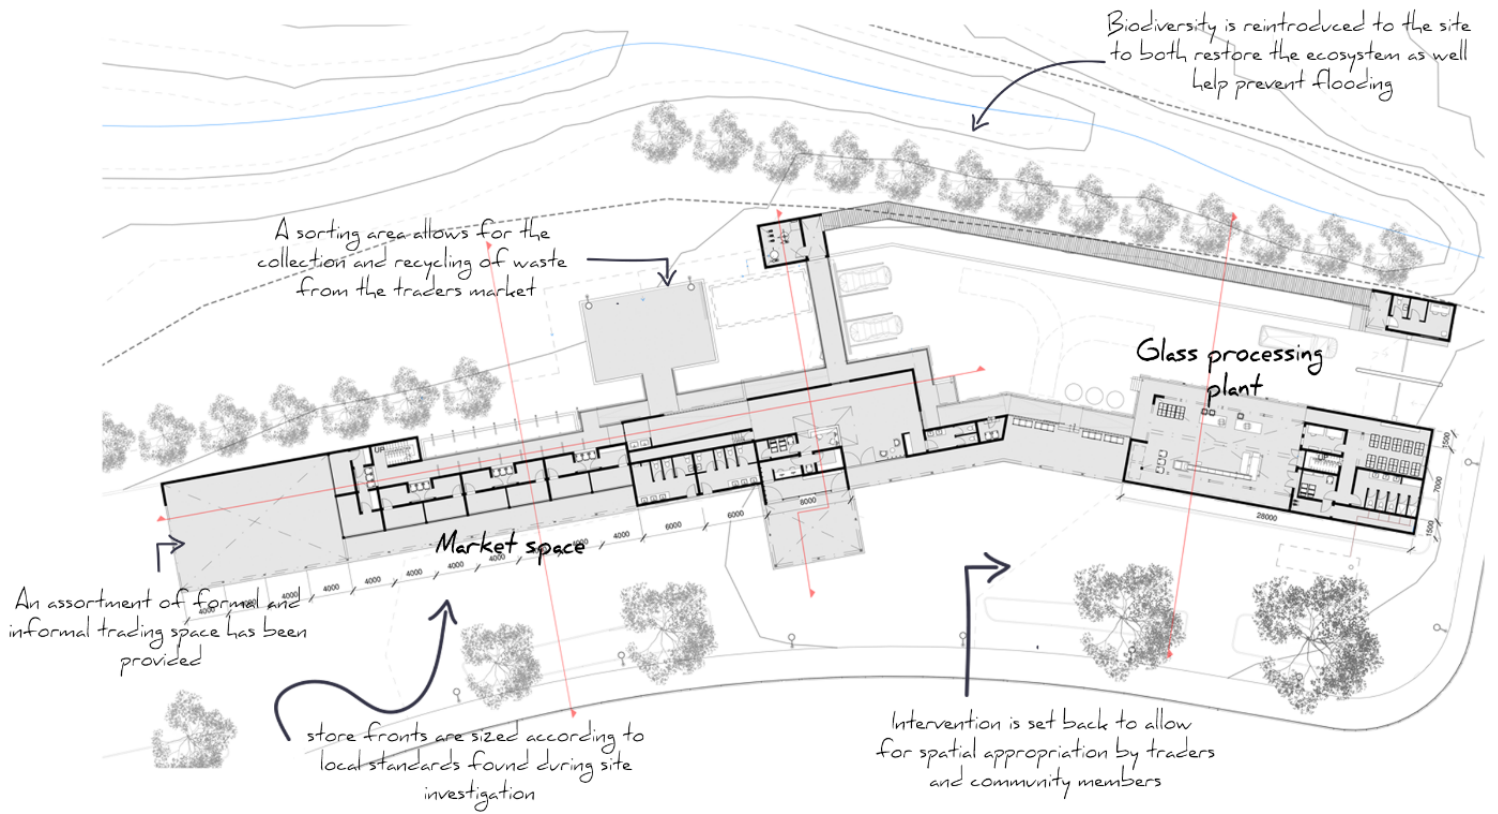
Ground floor plan of iteration four (Author 2021)
